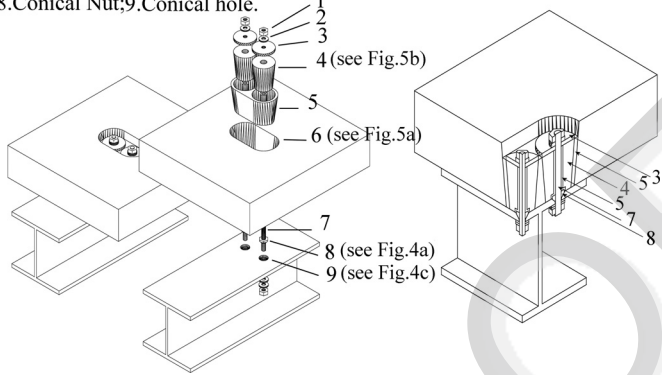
Precast steel-concrete composite bridge using the novel shear connector
